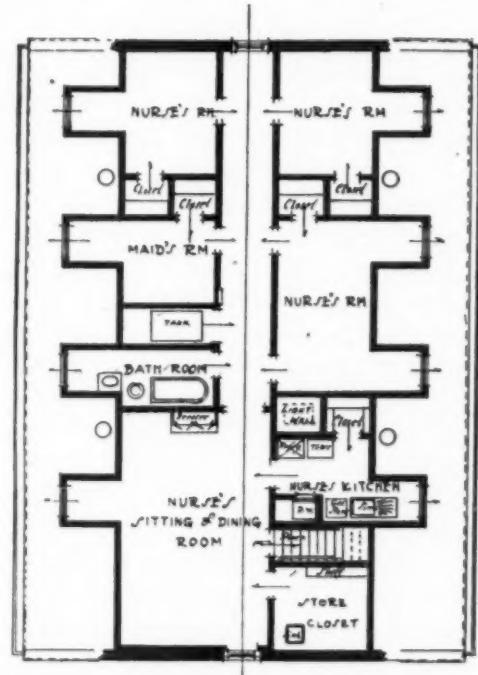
Hurley Hospital. Isolation unit. Second floor plan.
